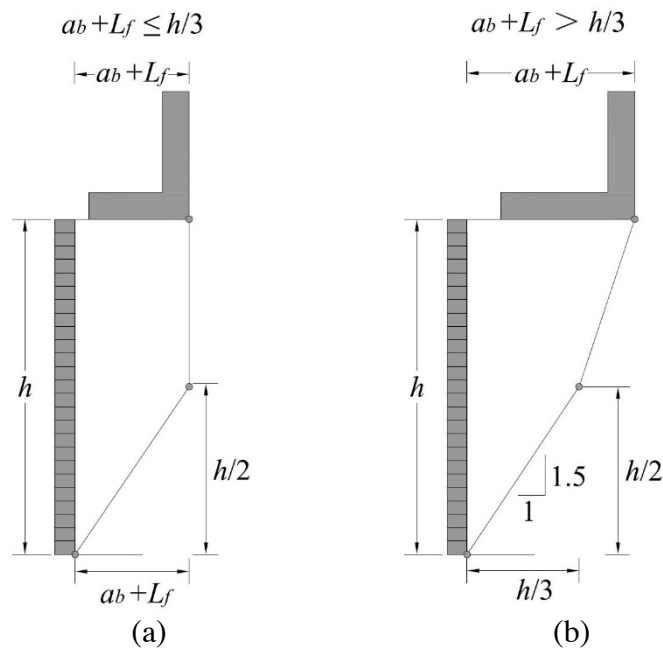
Proposed bilinear failure surface for GRS bridge abutment.
